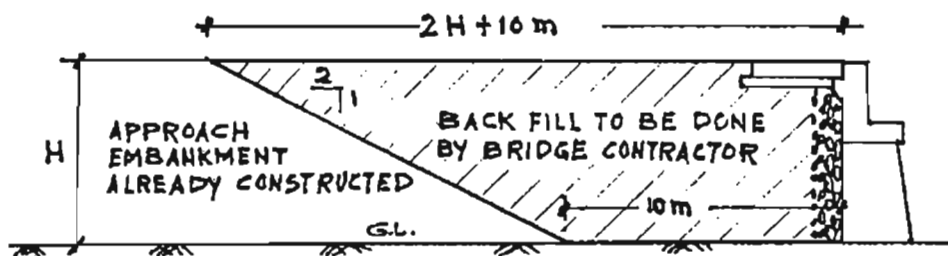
(a) CASE-I APPROACH EMBANKMENT CONSTRUCTED PRIOR TO CONSTRUCTION OF ABUTMENT
